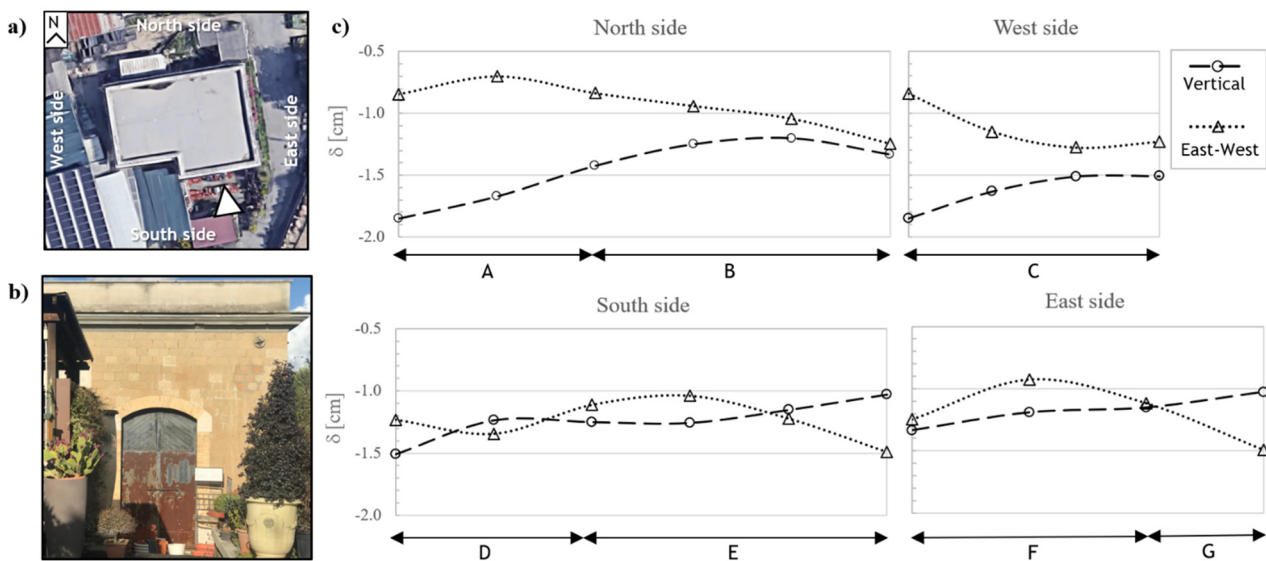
Collector sewer point of disposal n. 7*: (a) plan view; (b) picture of southern side; (c) settlement profiles along the four building sides.
